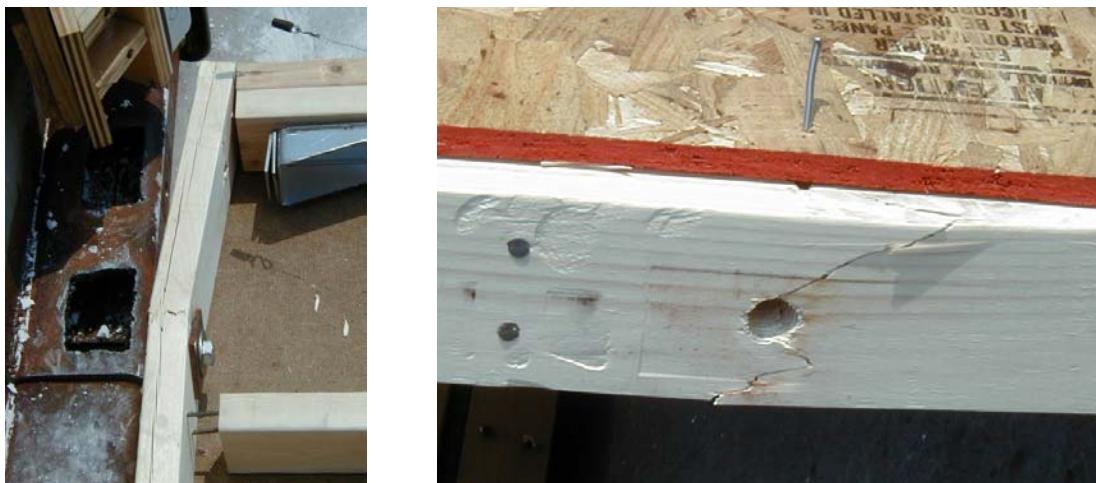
Bottom plate fracture at anchor bolt location
